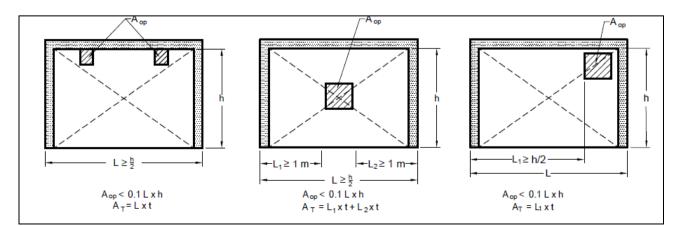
MASONRY WALLS WITH LARGE OPENINGS
